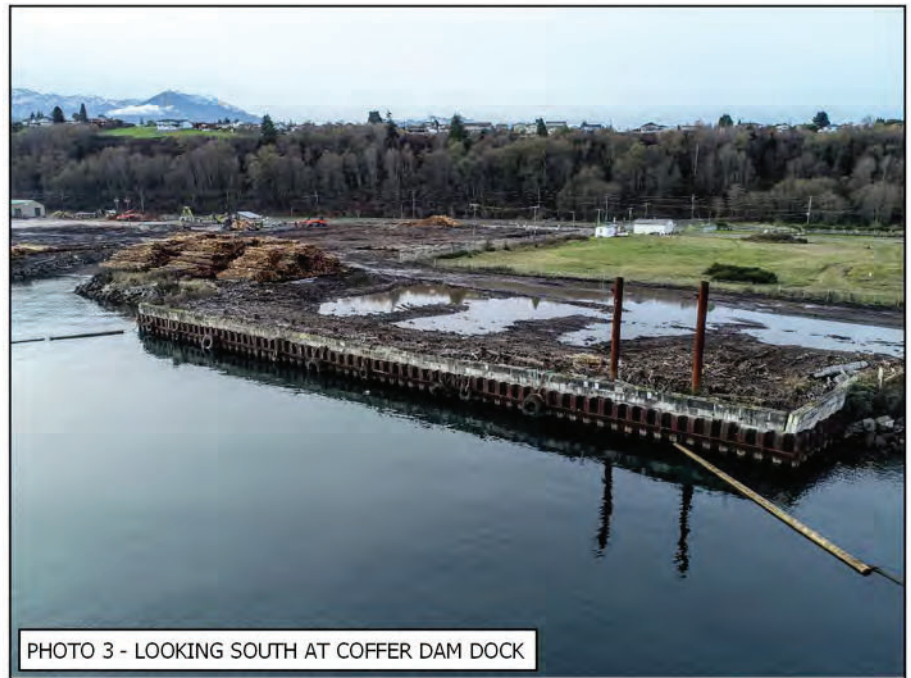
LOOKING SOUTH AT COFFER DAM DOCK
